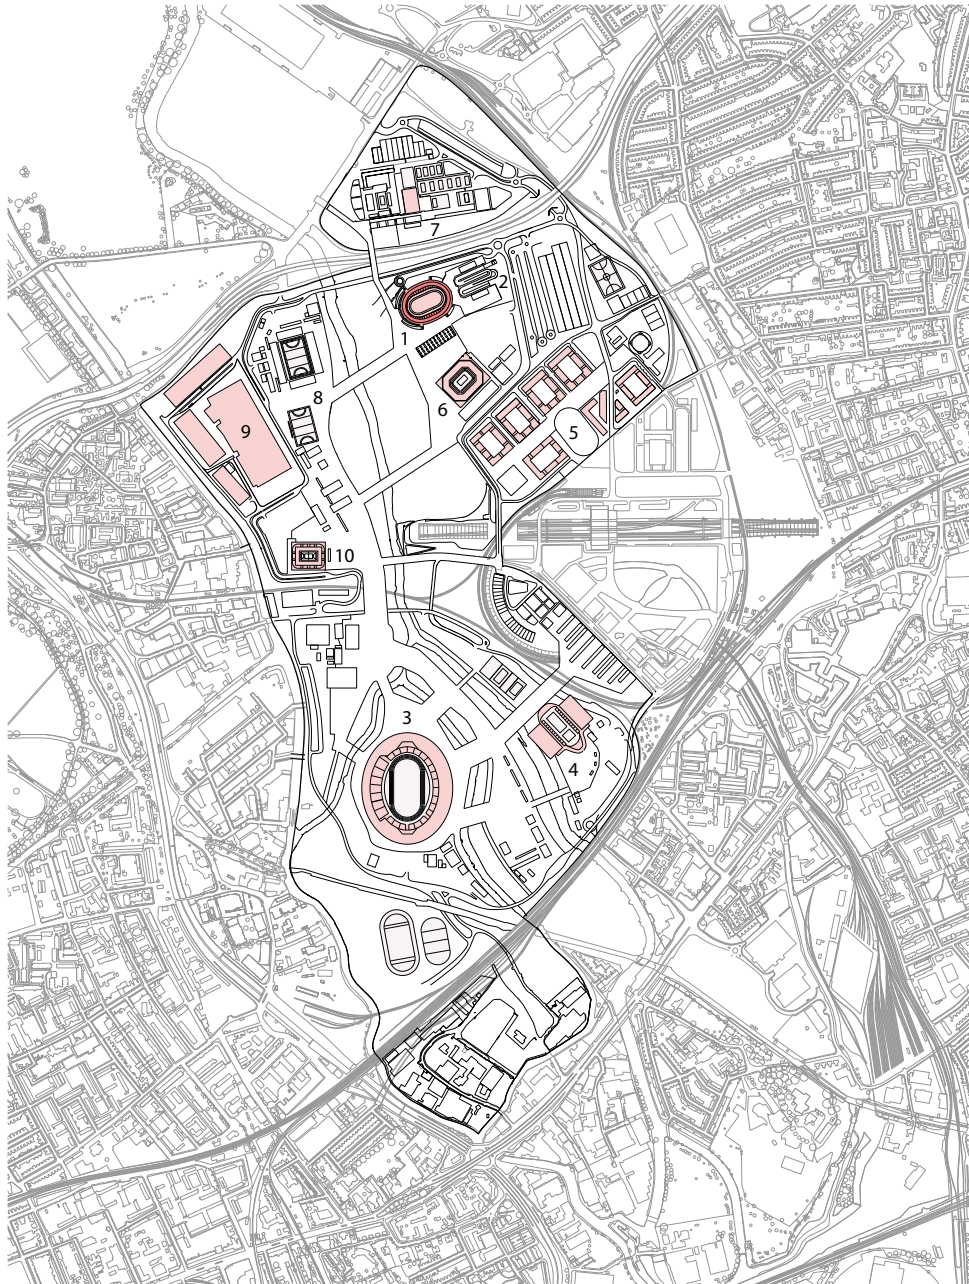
[left] 2012 Olympic Park Site Plan, nts:
